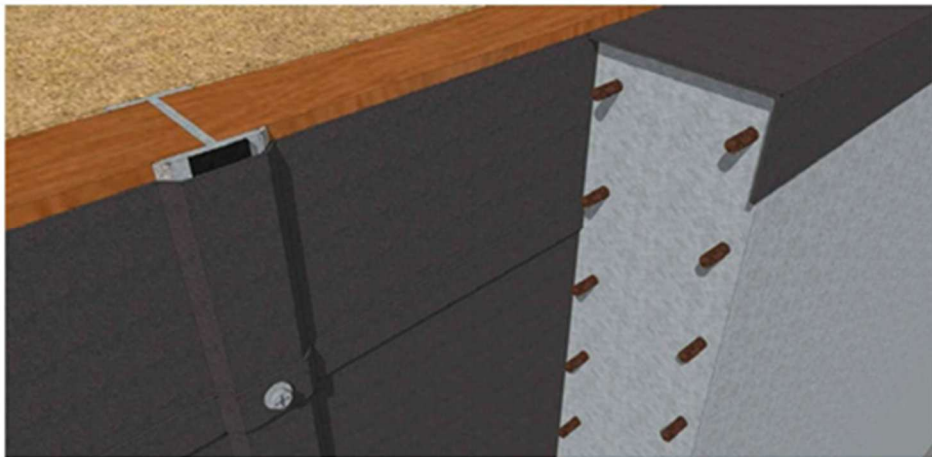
WORK JOINT SEALING – CROSS-SECTION
